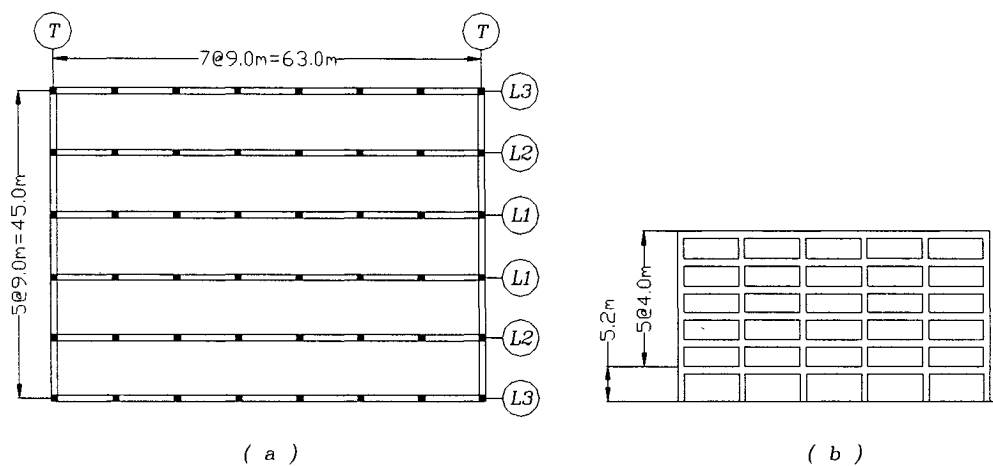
Buildings #1 and #2; (a) Plan of floors, (b) Elevation of transverse frames
